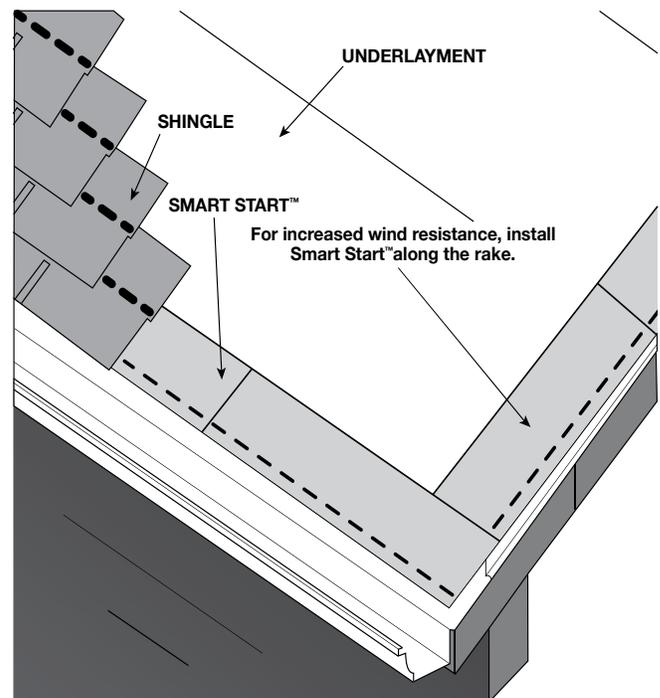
Application of Smart Start® along the Eave and Rake Edges of Roof
